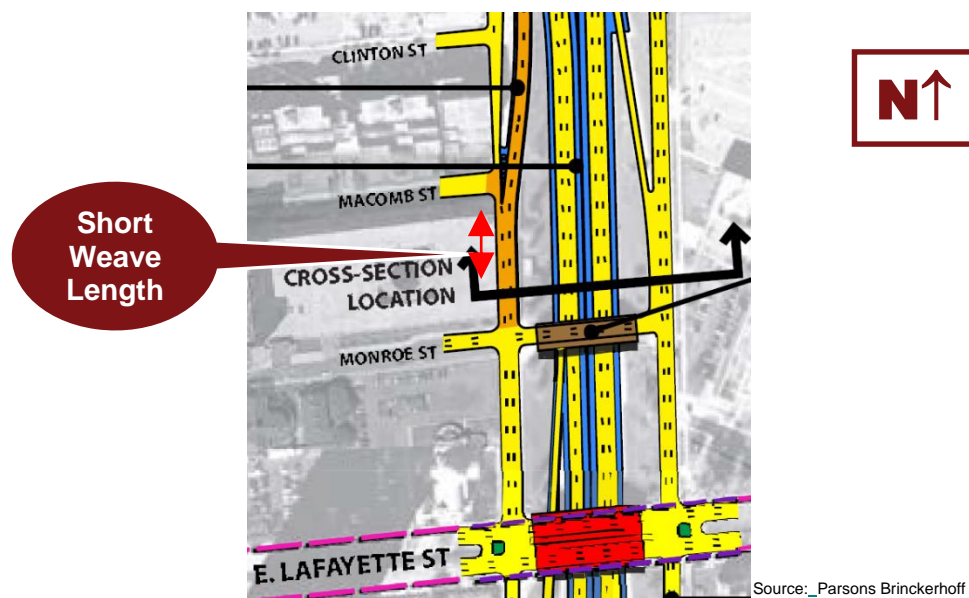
SB I-375 off Ramp Weave at Lafayette St
